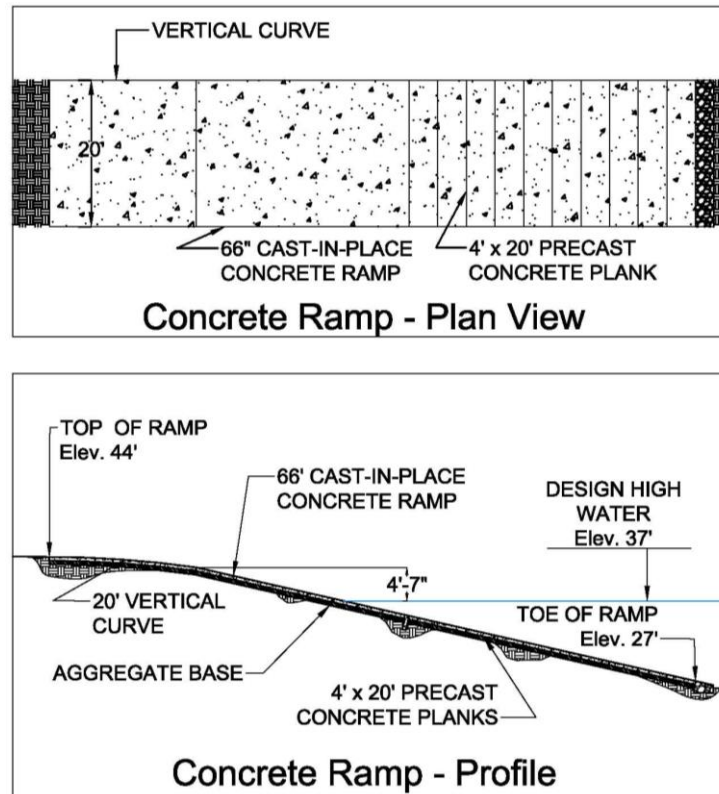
PLAN AND PROFILE VIEWS OF THE CONCRETE RAMP DESIGN
